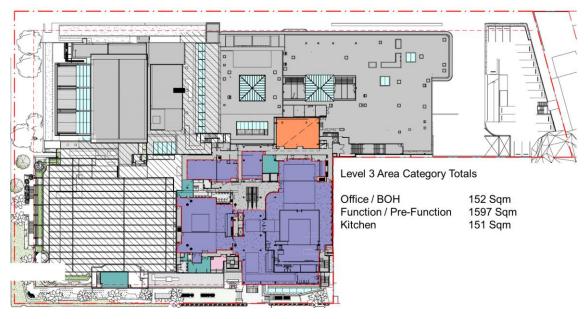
Proposed Level 3 layout (Source: Altis Architecture)
